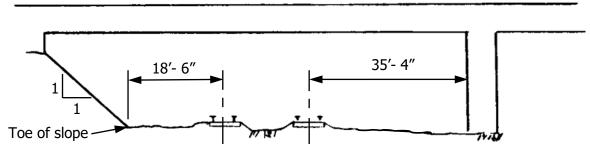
Bridge elevation view indicating horizontal offset for two railroad tracks below the bridge.
